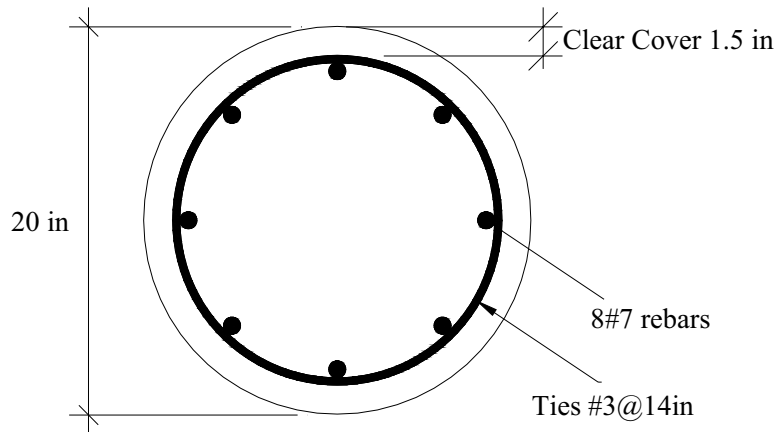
Section A-A & C-C; Specimens A1, A2 & A3
